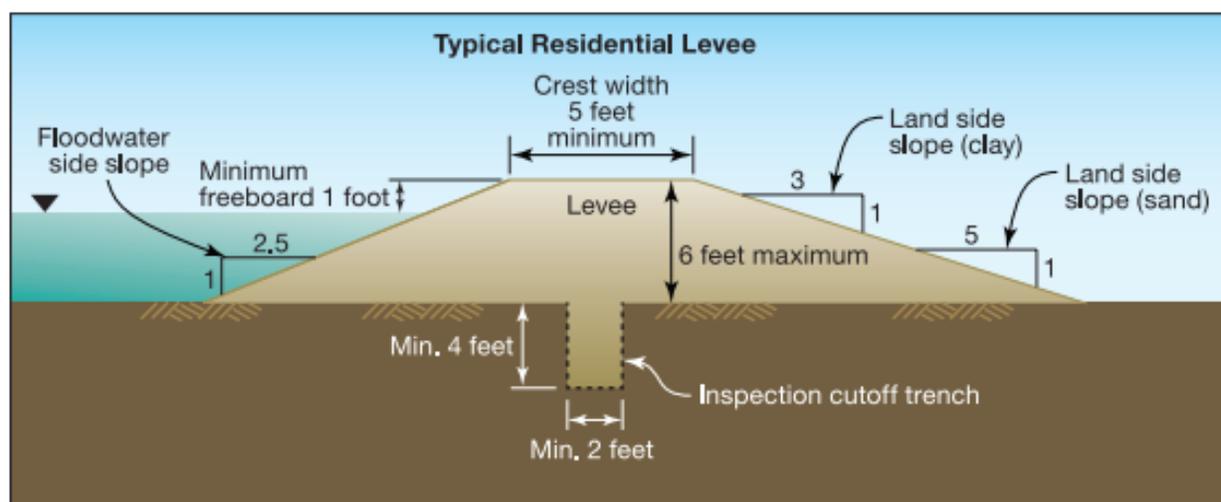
Typical Earthen Levee Cross Section (ref. FEMA)
